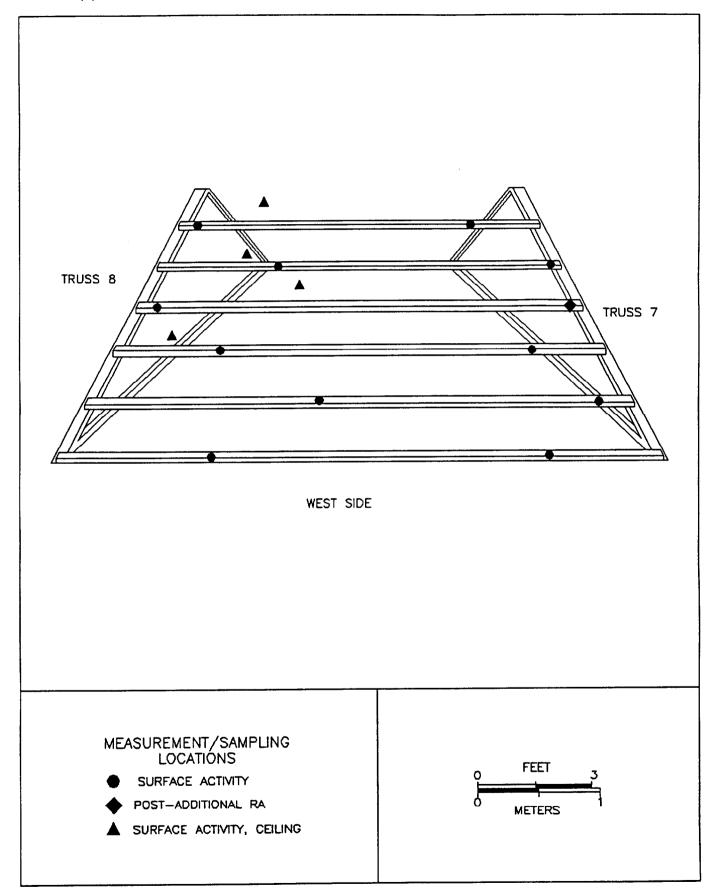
Building 3, Bay 7, West — Measurement and Sampling Locations
